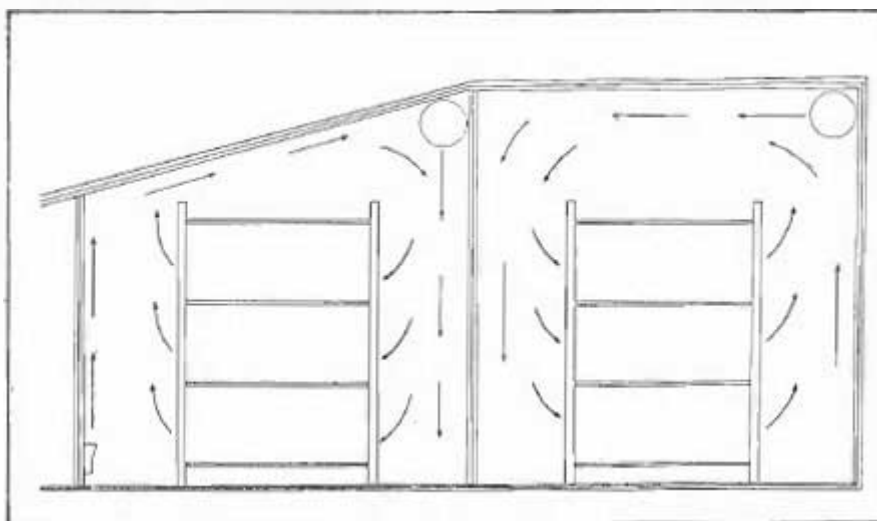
Wall mounted duct directing airflow across the width or down the sidewall of the room.
